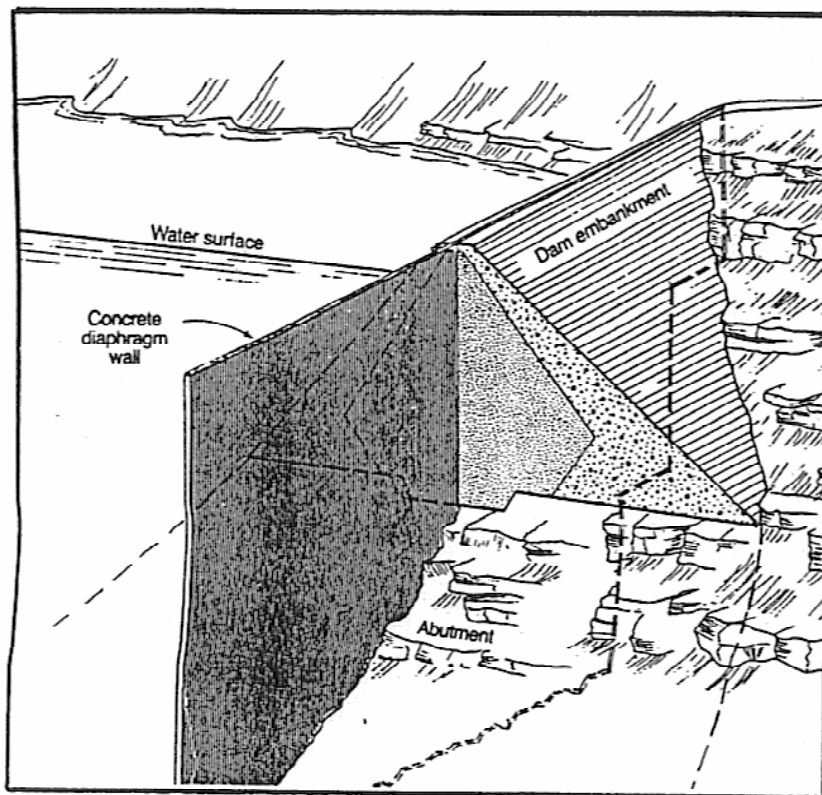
Concept of Left Abutment cut-off wall, Navajo Dam (74).
